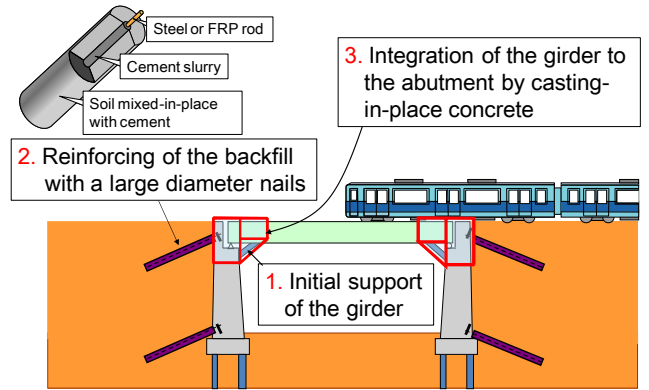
A new method to reinforce old conventional type bridges (n. b., the numbers denote the construction sequence).
